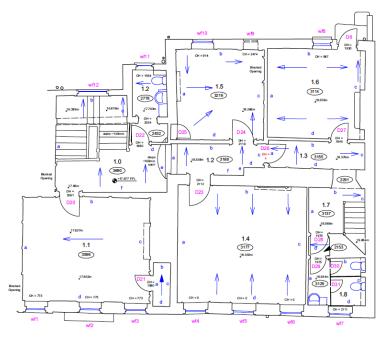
First Floor layout in plan, scaled. c/o Maybank Building Conservation
